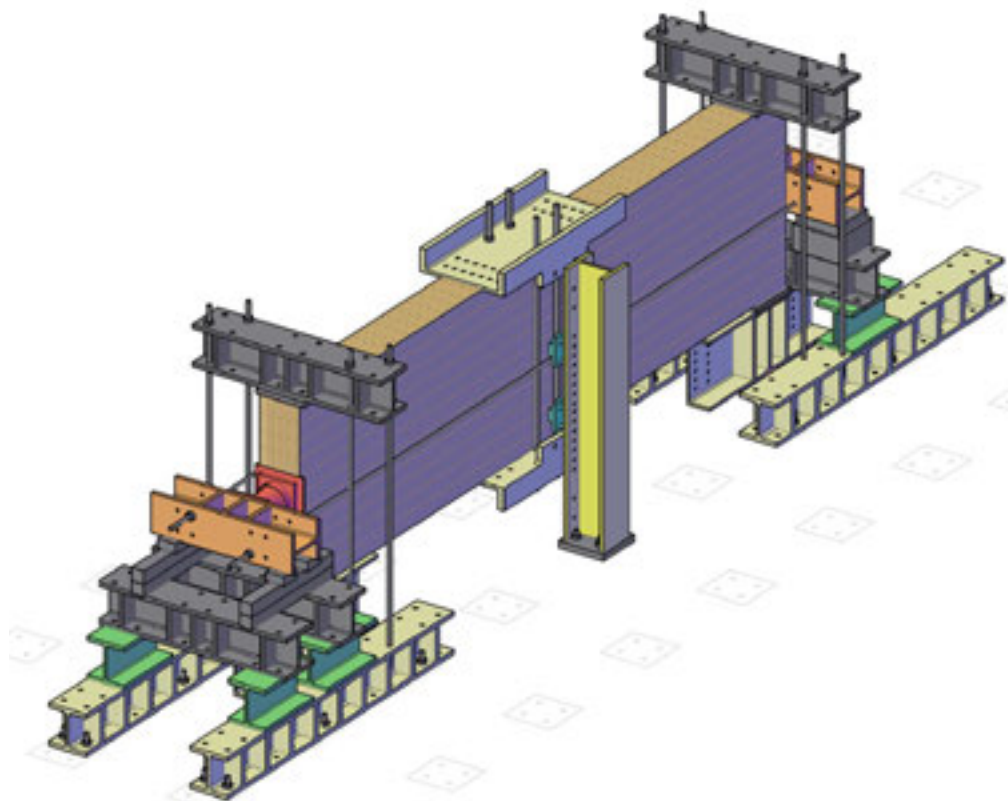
Schematic 3-D view of test setup with typical CLT9 wall specimen.
